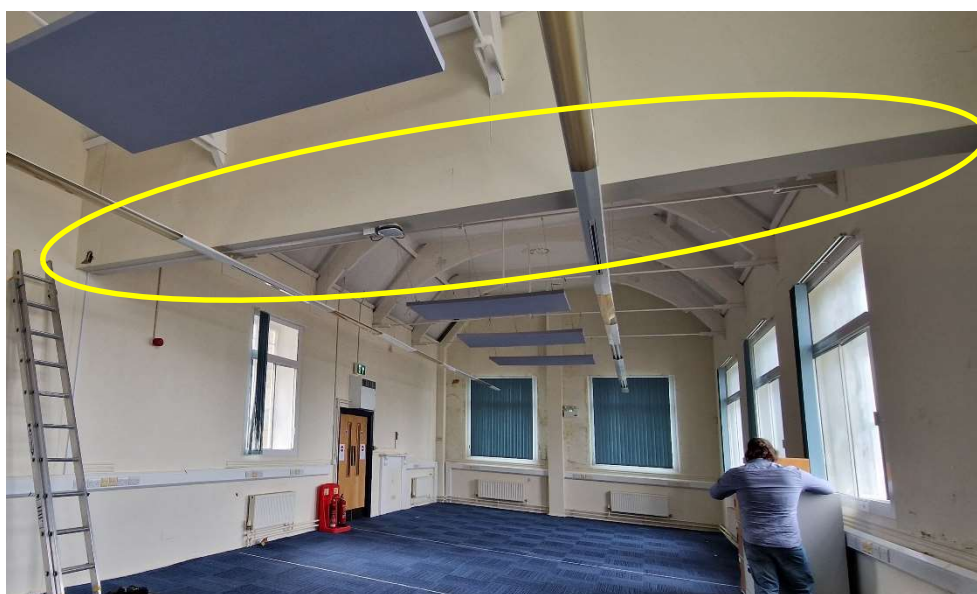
Photograph of bulkhead enclosing 203x102UB steel beam
